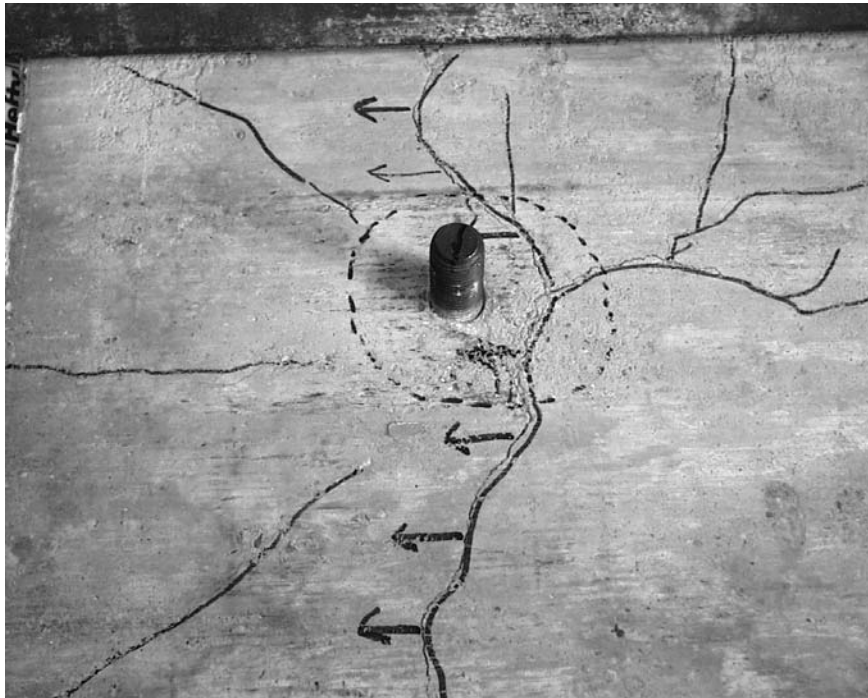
Significant cracking of concrete slab for Specimen HTFAT02
